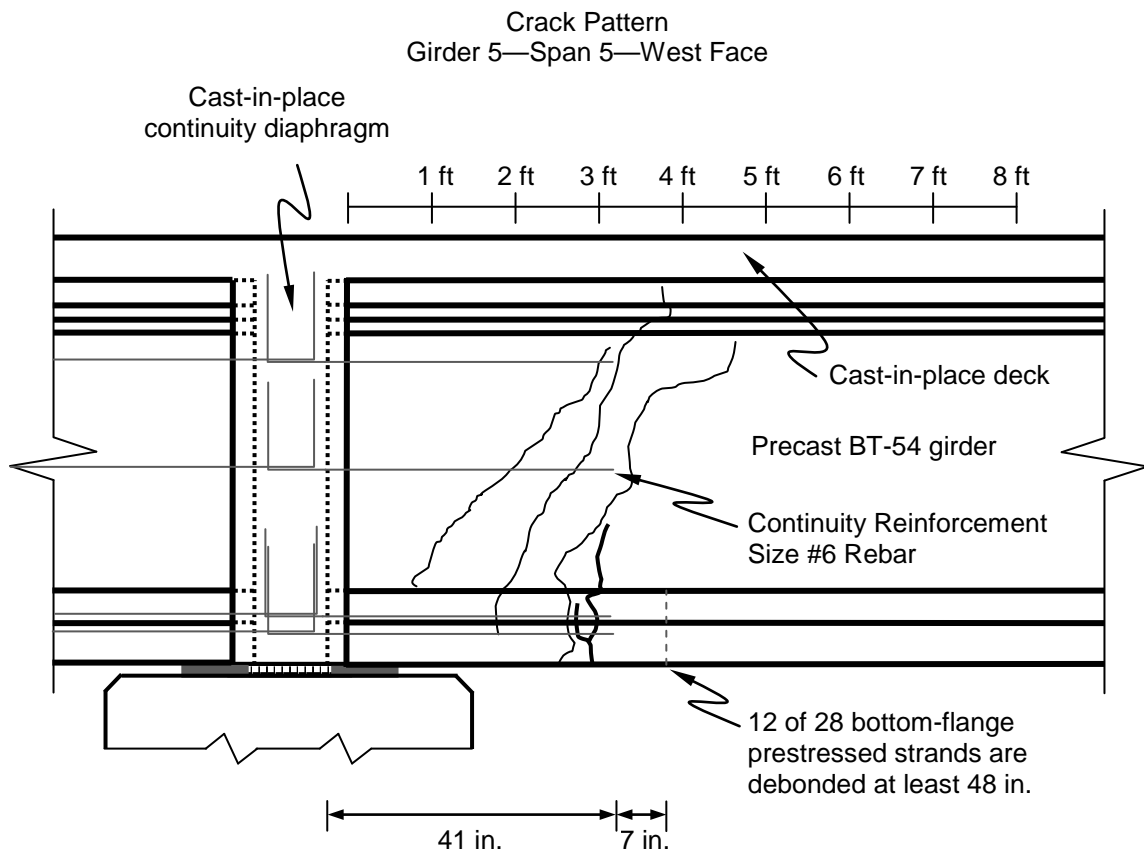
Cracked girder with continuity reinforcement details (Barnes et al. 2006)
